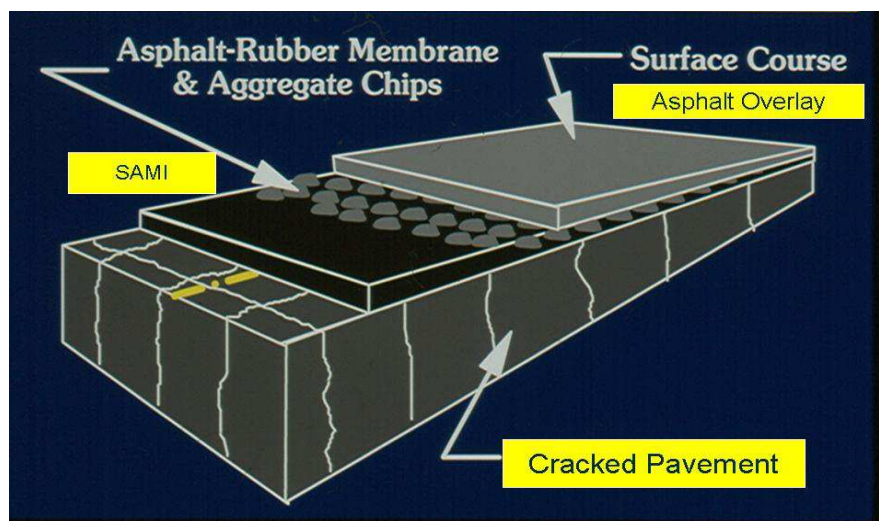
Schematic of a cracked pavement receiving an ARAMI prior to an HMA overlay.
